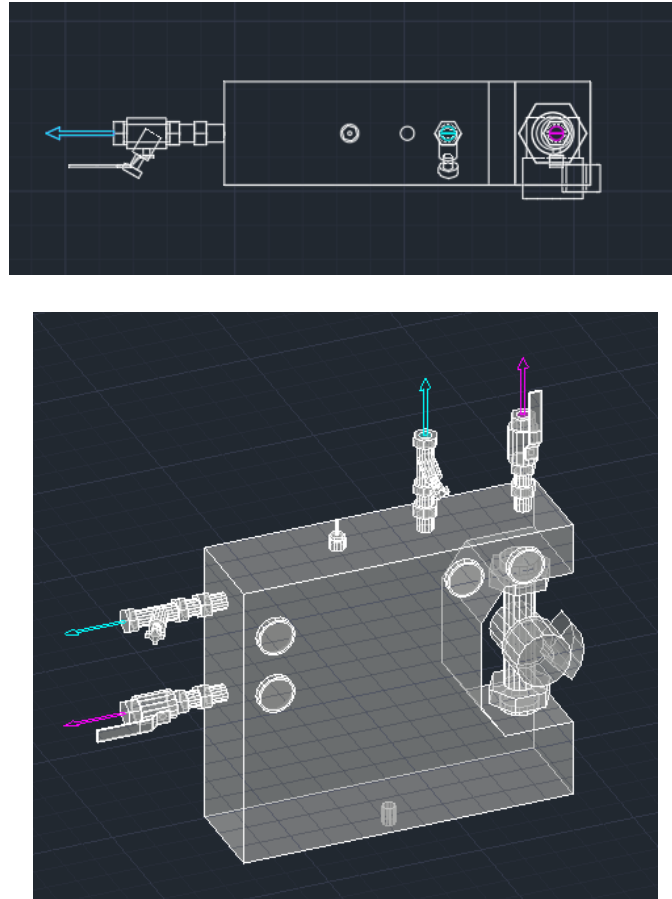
Shunt unit inserted in to AutoCAD drawing and MagiCAD project
